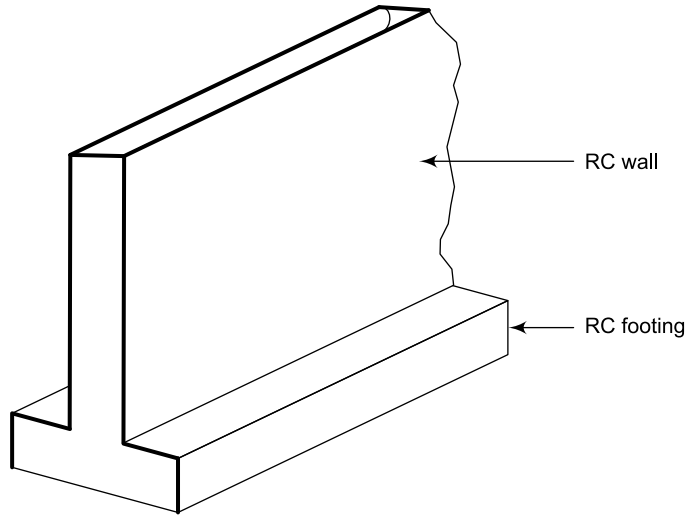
View of a Typical Concrete Footing and Foundation Wall.
